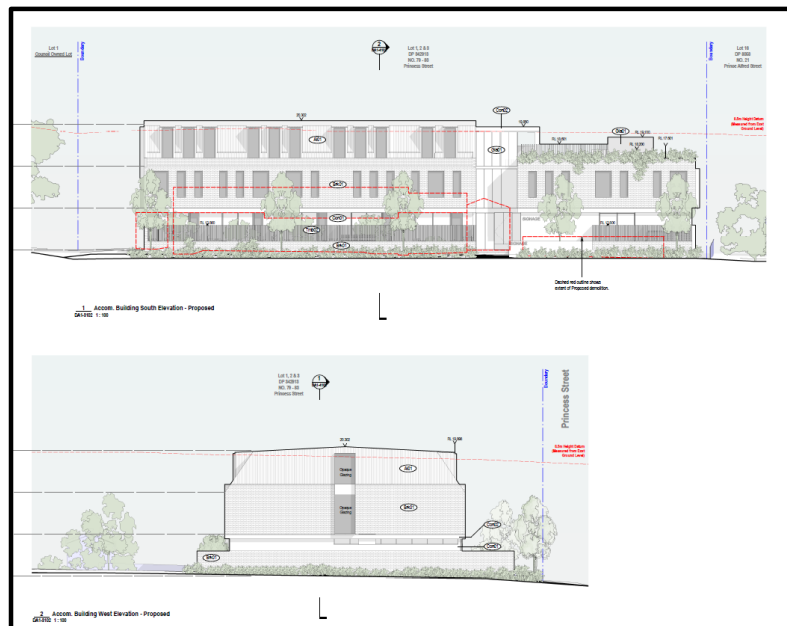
Motel Accommodation Elevation (South and West) (Source: H&E Architects.
